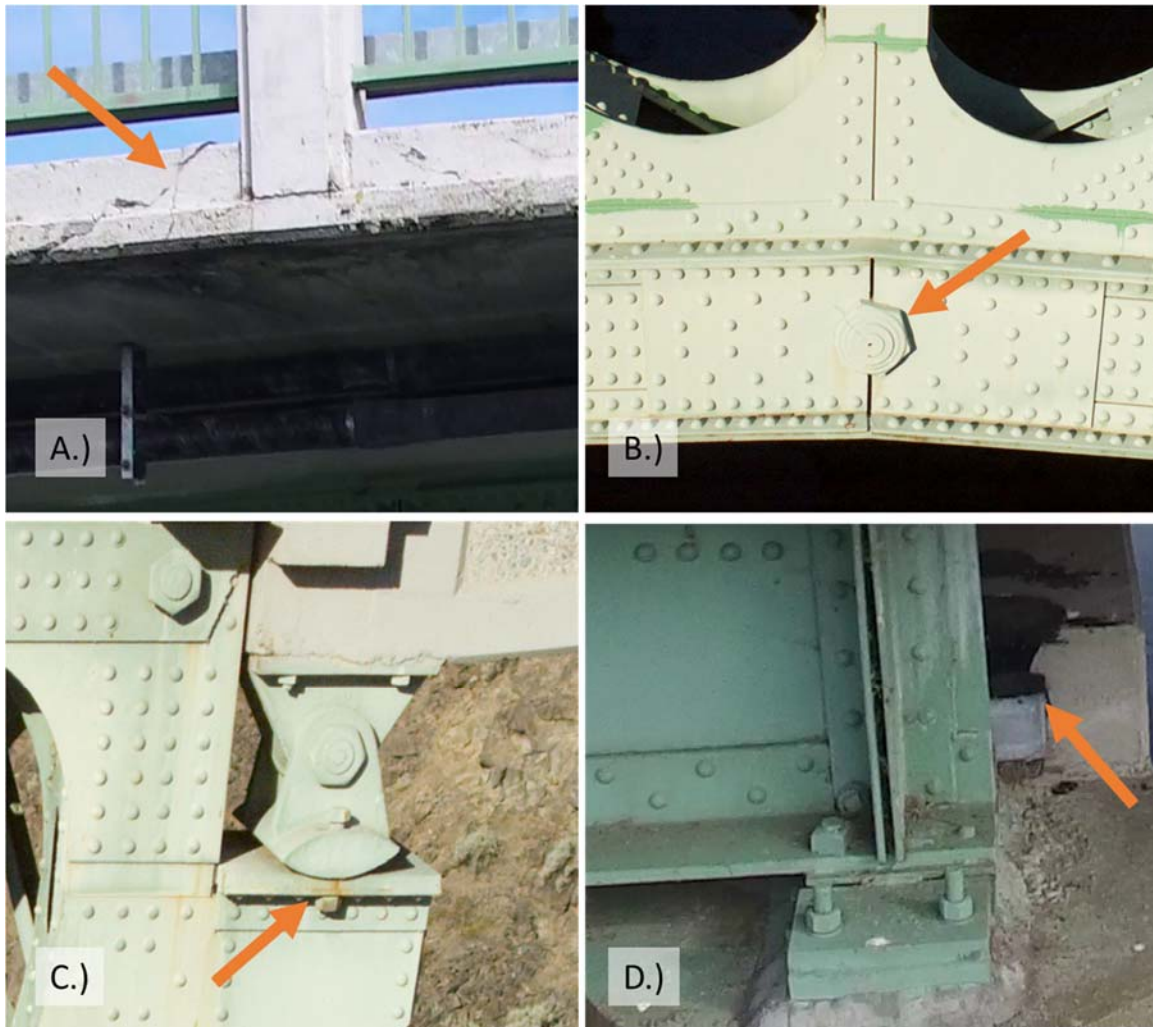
A.) Concrete railing cracking not visible from the bridge deck B.) Large center bolt and gusset plate C.) Concrete bearing on steel and large steel bolts some rust visible D.) Steel bearing on concrete pier with possible tar leaking through a joint
